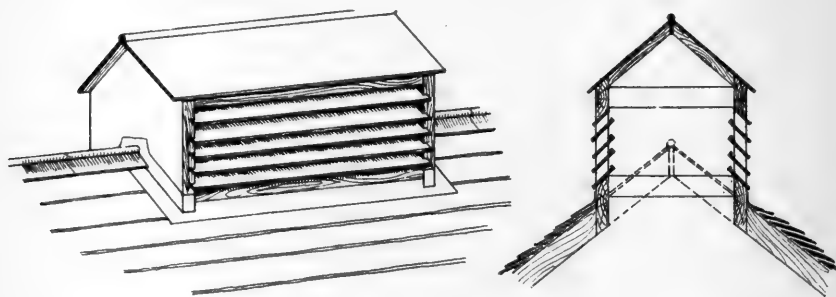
Illustration and section of a Louvre-Board Air Outlet Box fitted to the roof ridge.
